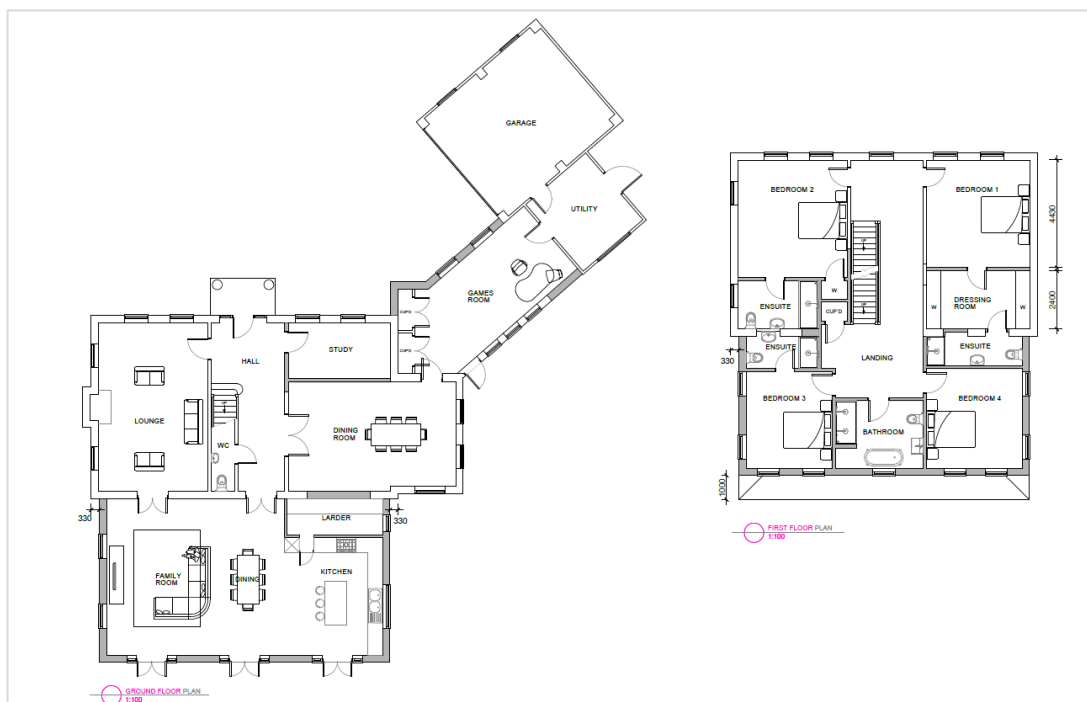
PROPOSED GROUND & FIRST FLOOR PLANS (DRAWING NO. BDS-DB-P02)
